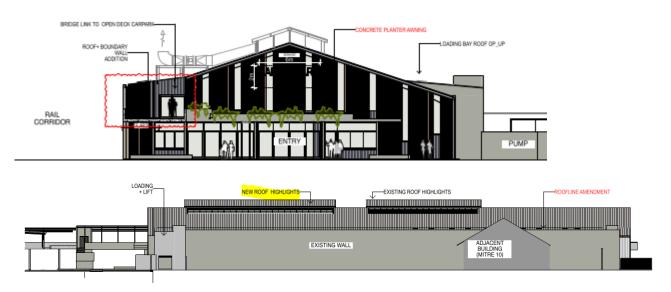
Roof pop ups highlighted yellow comply with architectural roof feature clause
